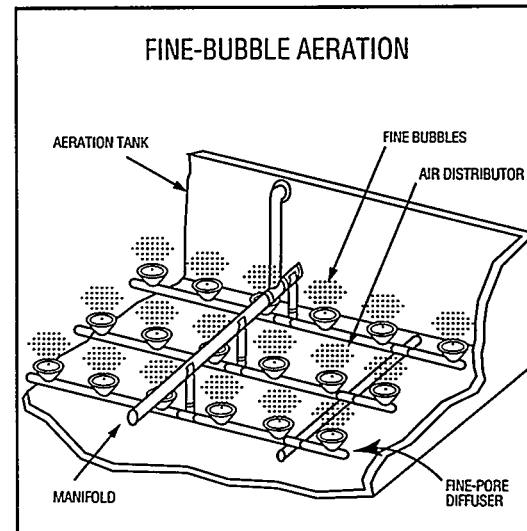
A cross-section of a typical fine-bubble aeration tank at an activated sludge treatment plant.
